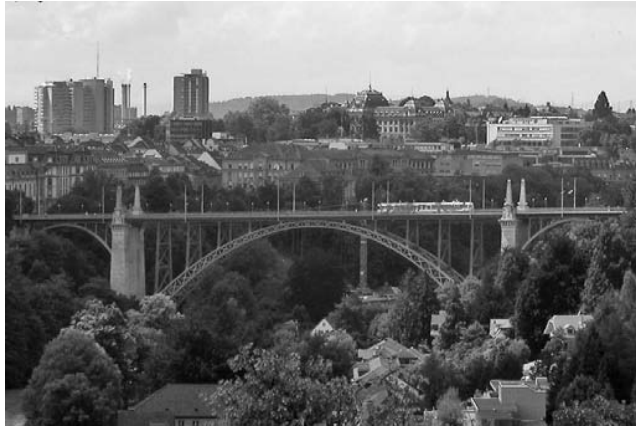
Truss-Arch Bridge in Bern, Switzerland
